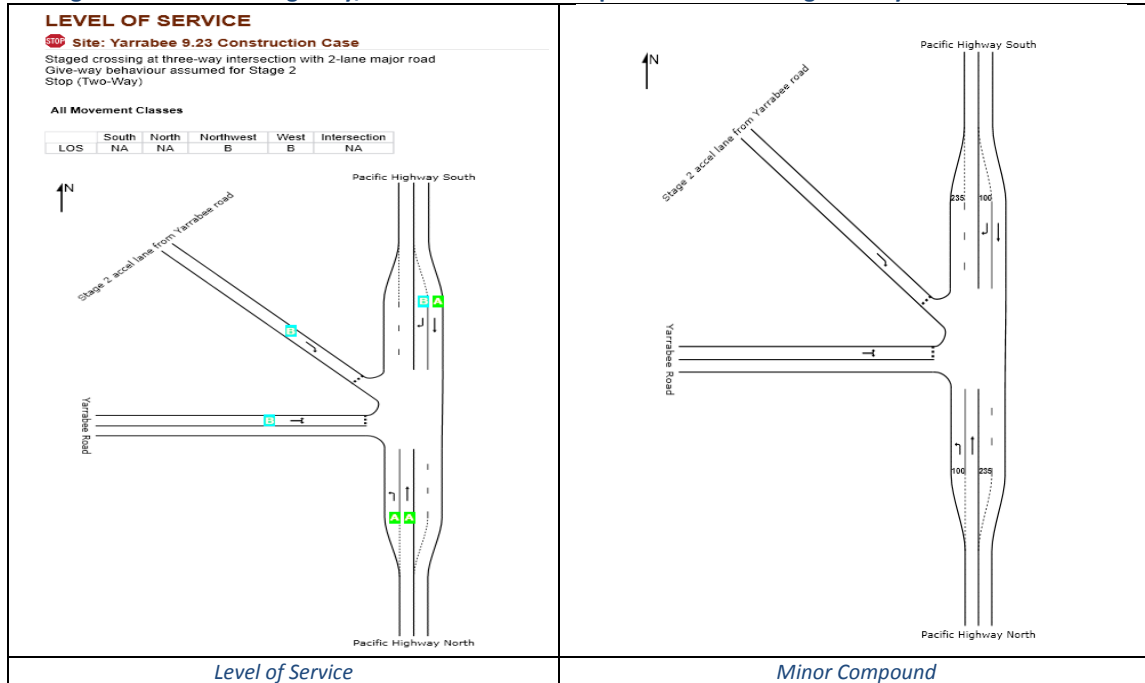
Pacific Highway/ Yarrabee Road - Proposed construction geometry
